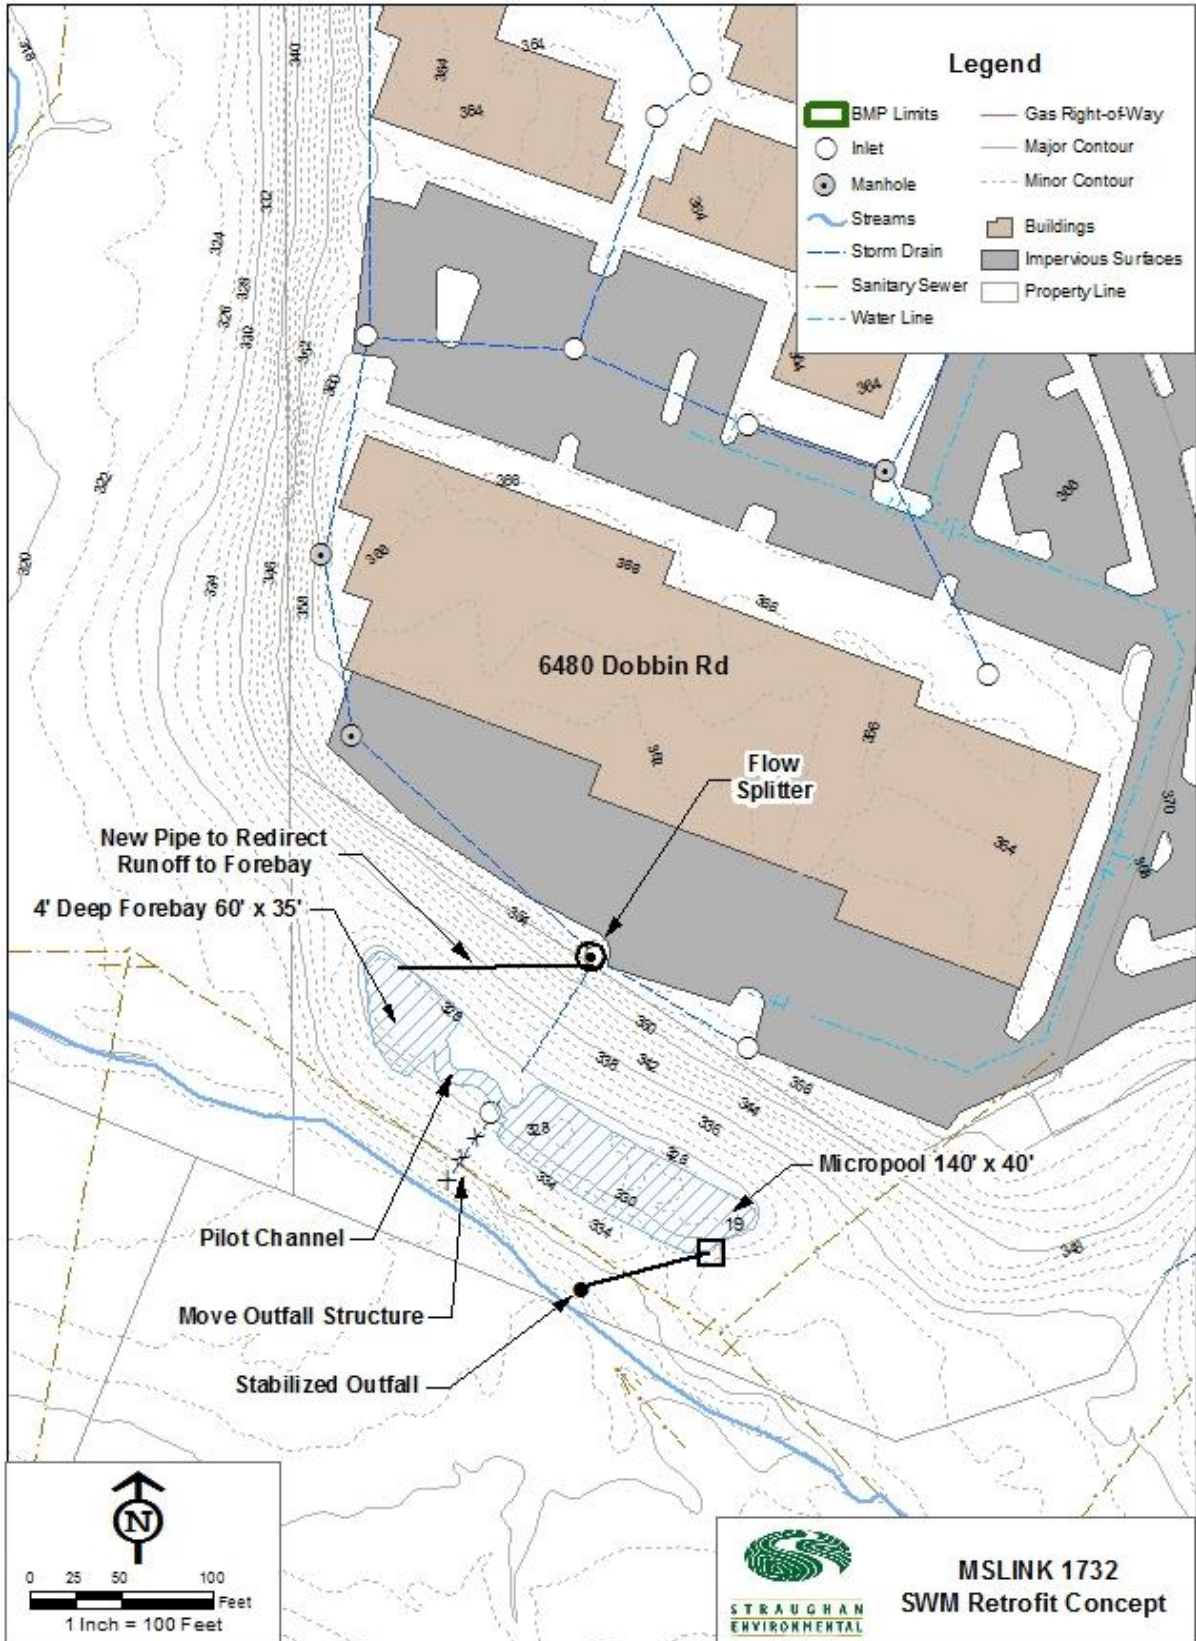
Concept Design Plan View 6480 Dobbin Road, Dobbin Road Commercial Business Center, SLP-BC-D792
